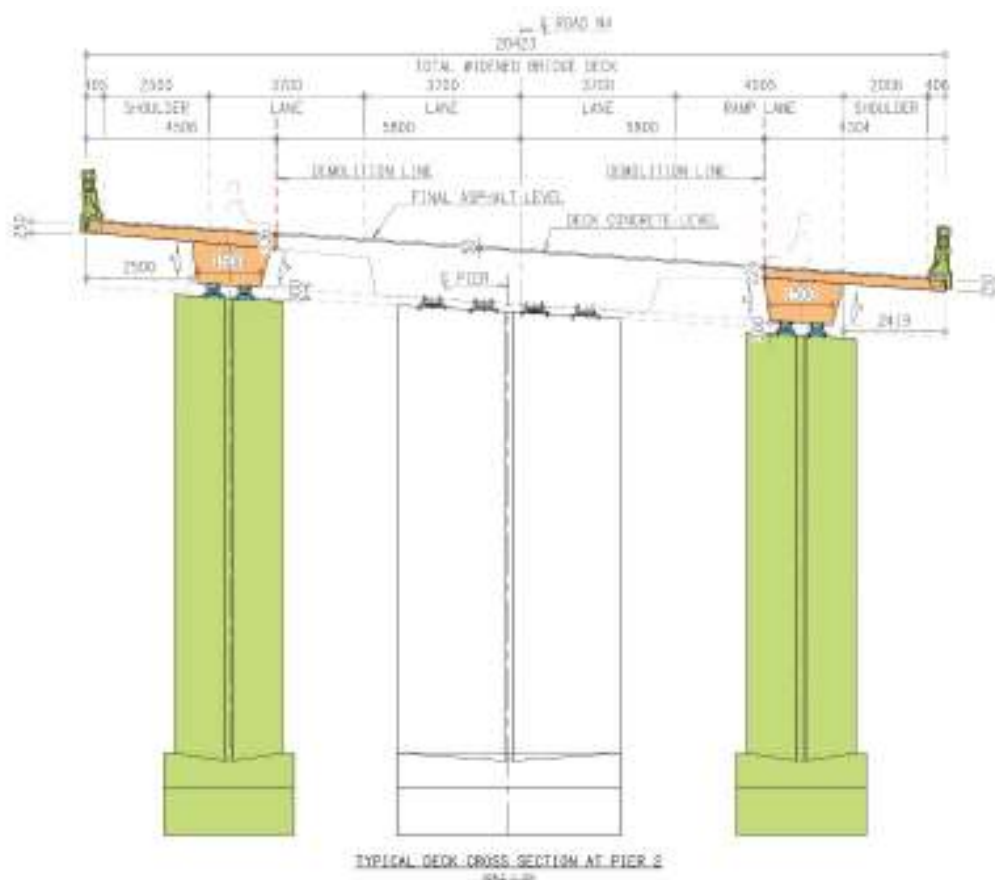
Typical Option 1 sub-structure at Pier 2
